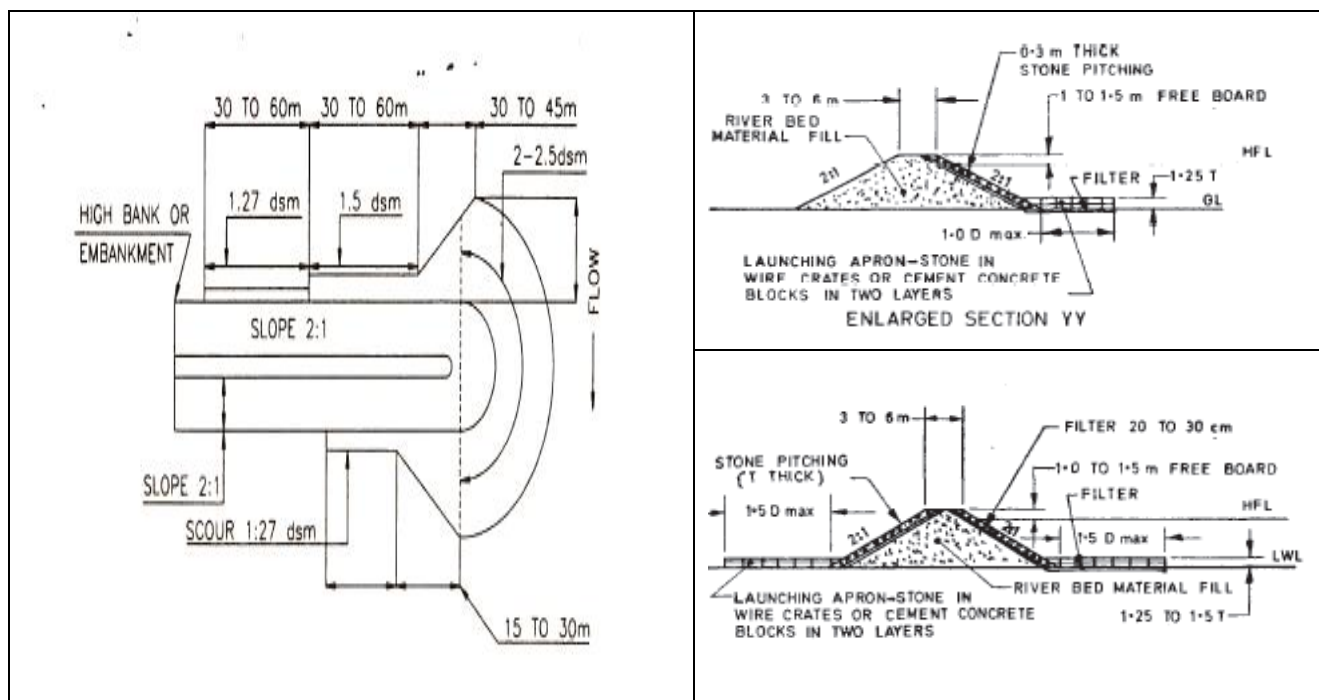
Plan showing Value of Multiplying factor, Maximum scour for spurs and Cross Sections
